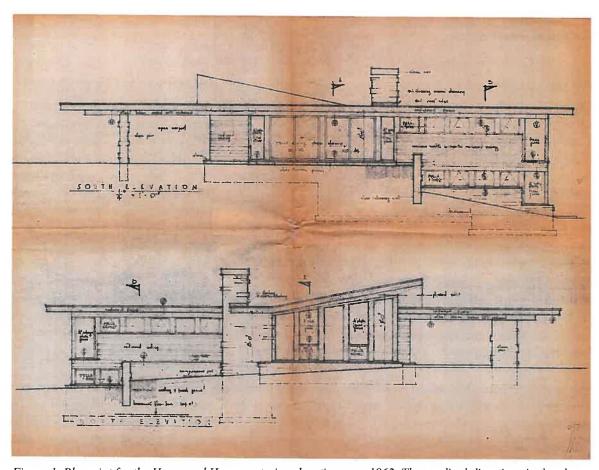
Blueprint for the Hammond House, exterior elevations, ca. 1962. The cardinal directions in the plans differ slightly from the orientation on the parcel. The "South" elevation in Fritz's drawings is listed as "East" in the nomination as it is more of a western orientation. Fritz's "North" Elevation is listed as "West" in the nomination.
